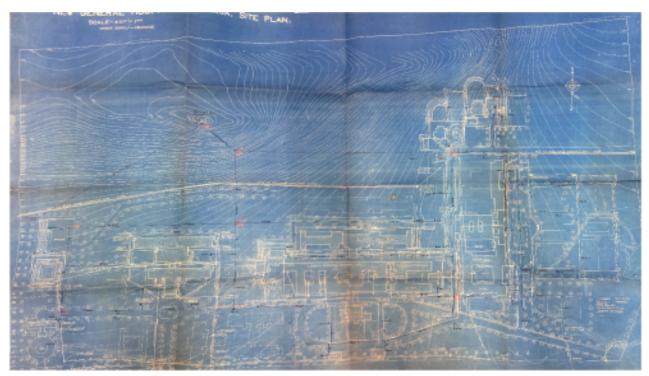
Pretoria Hospital site plan (NARSSA, 2023)
